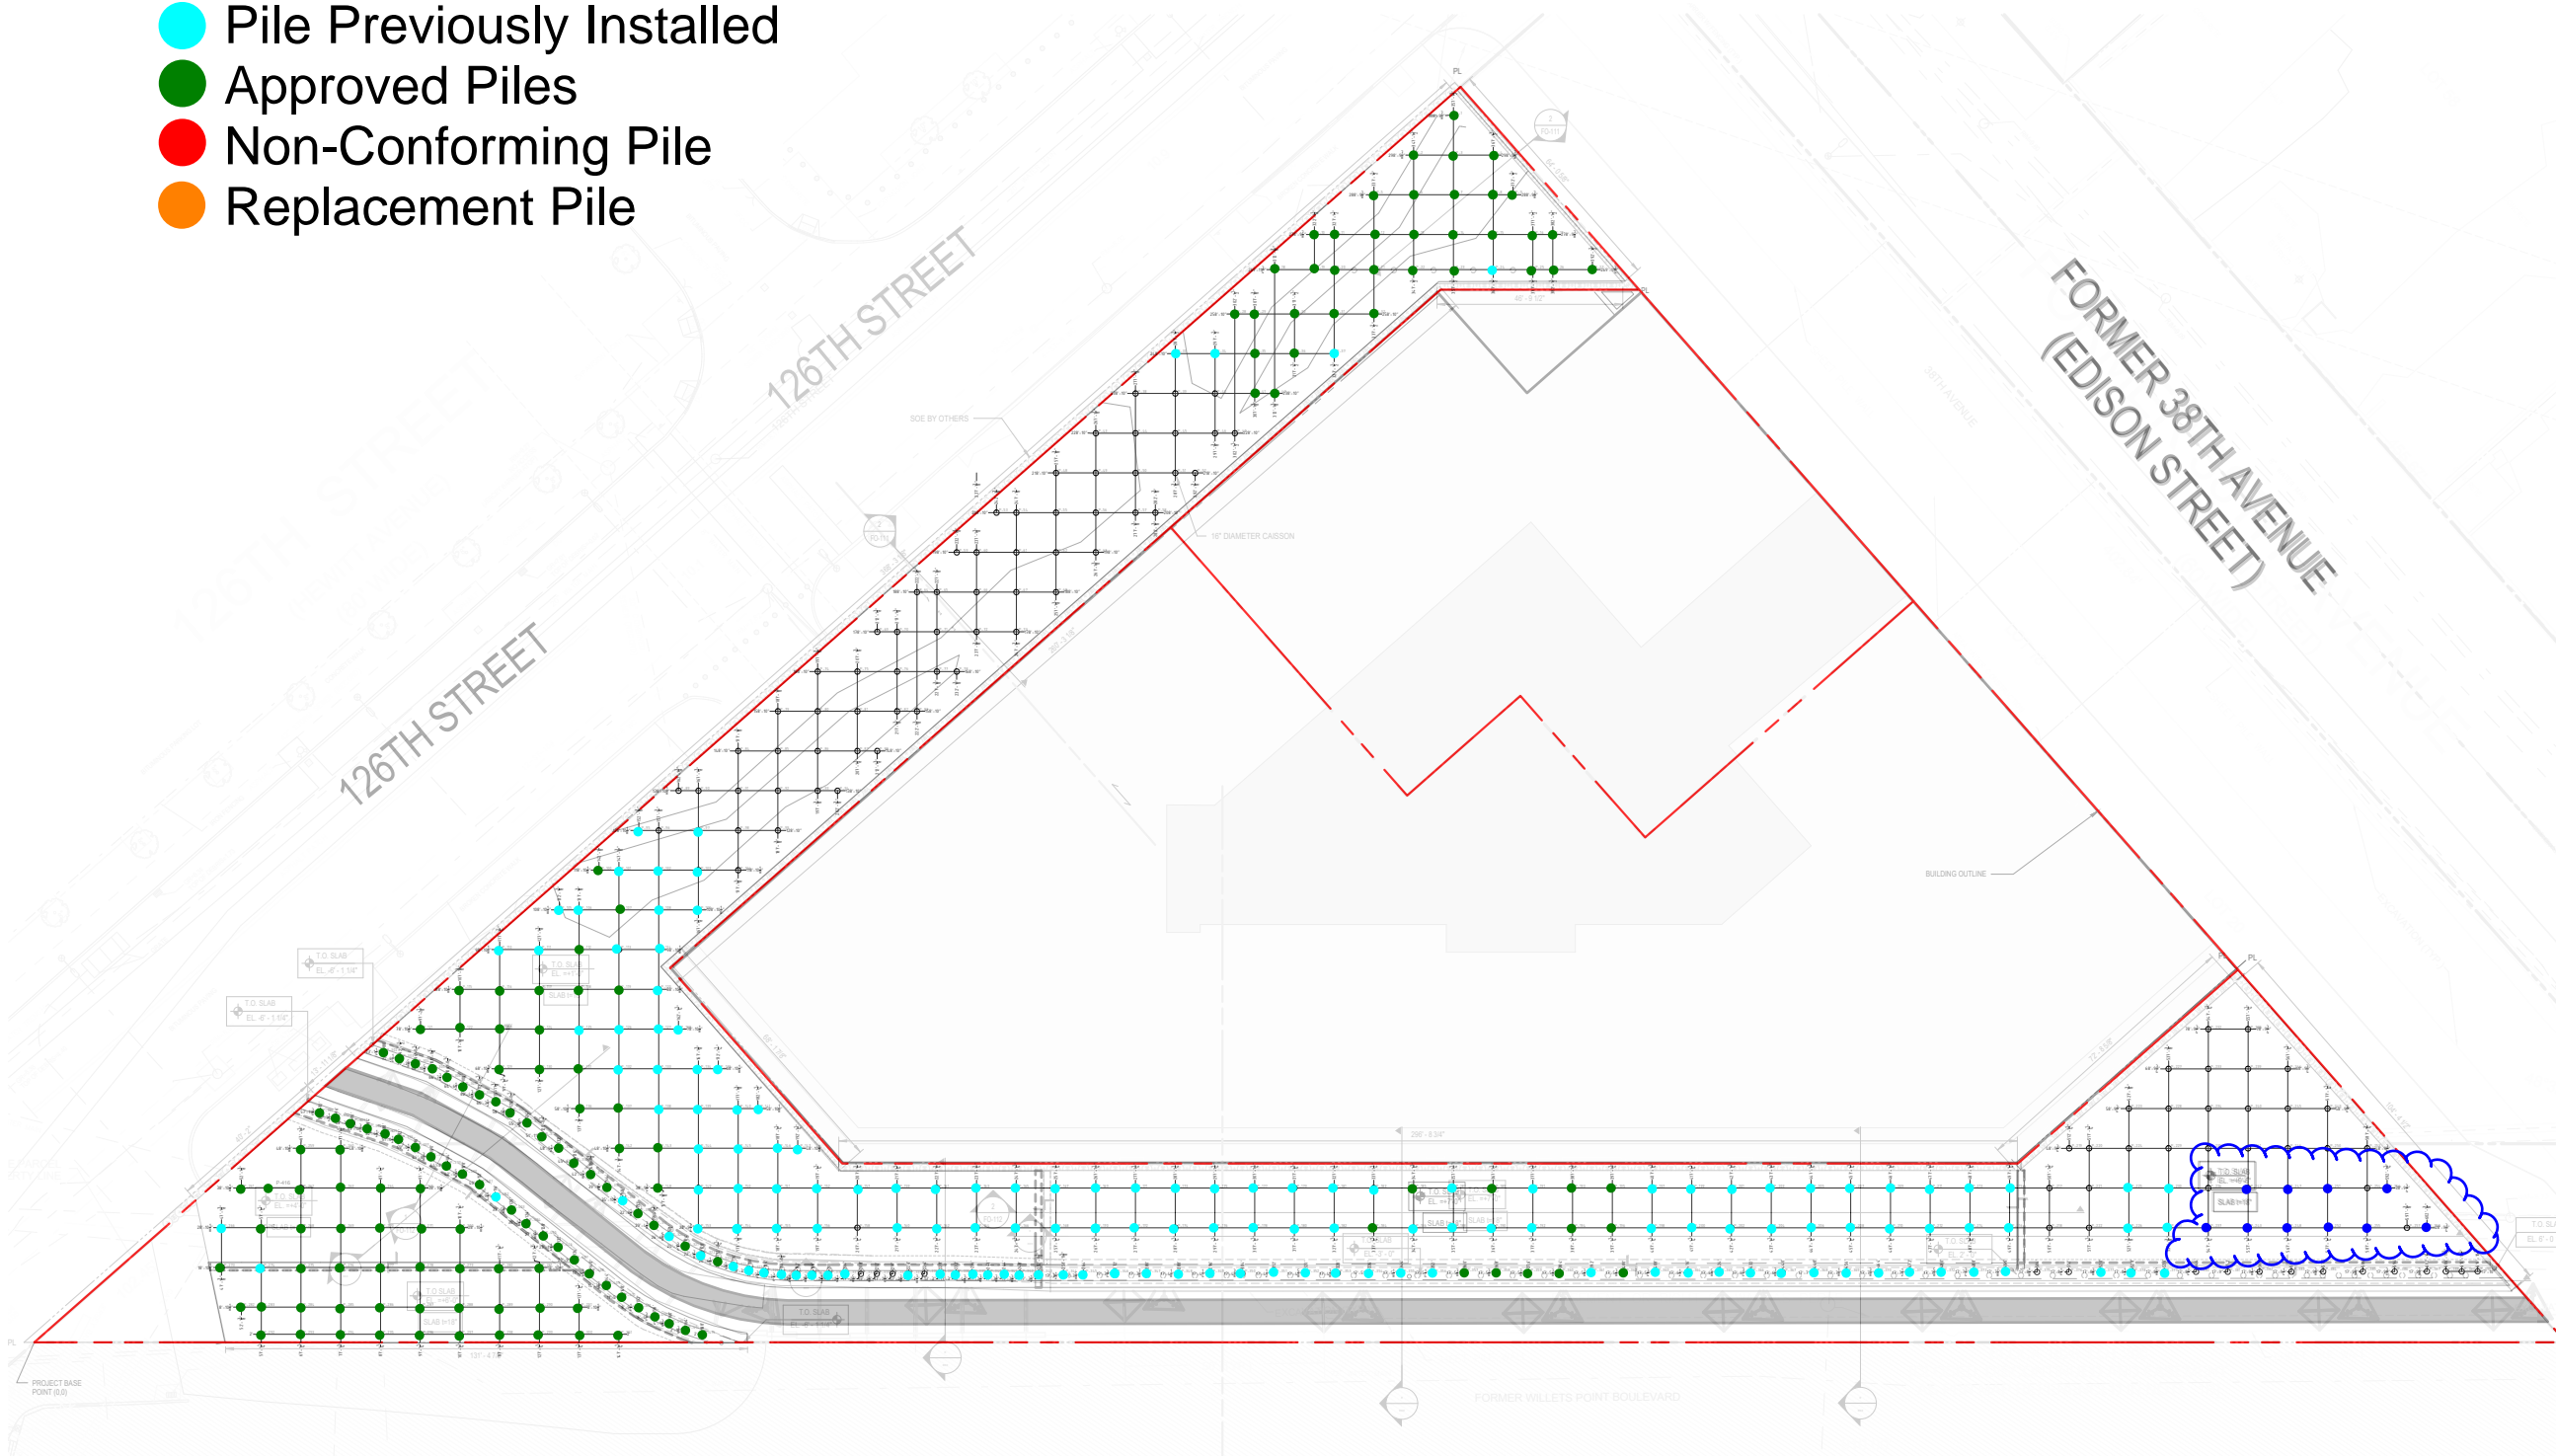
Pile Location Plan - Submittal #10, dated 6/2/2025
